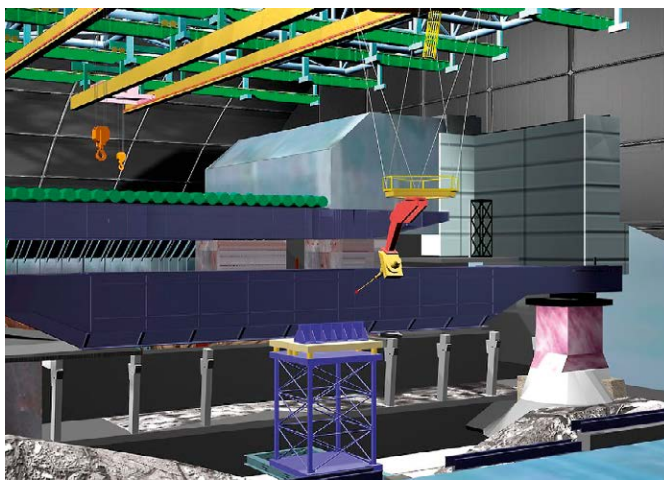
Using the NSC crane with MIP and a manipulator equipped with a special air-plasma device transverse cutting of the Mammoth Beam branches is performed
